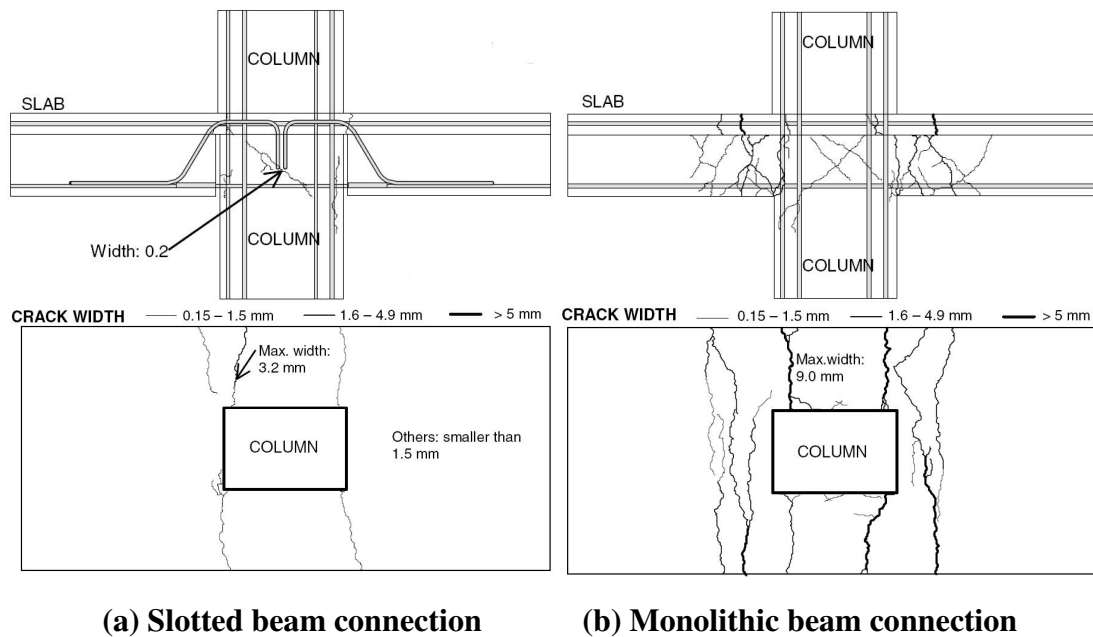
Joint and floor crack patterns from tests carried out by Ohkubo and Hamamoto (2004)
